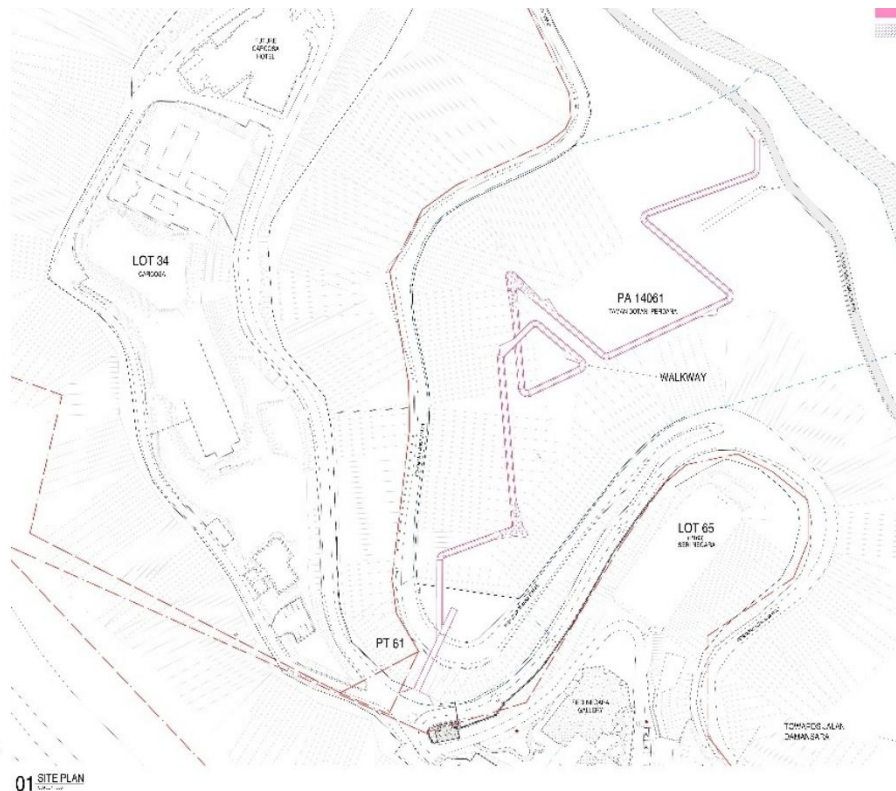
1 Carcosa Seri Negara Link Bridge Site Plan
